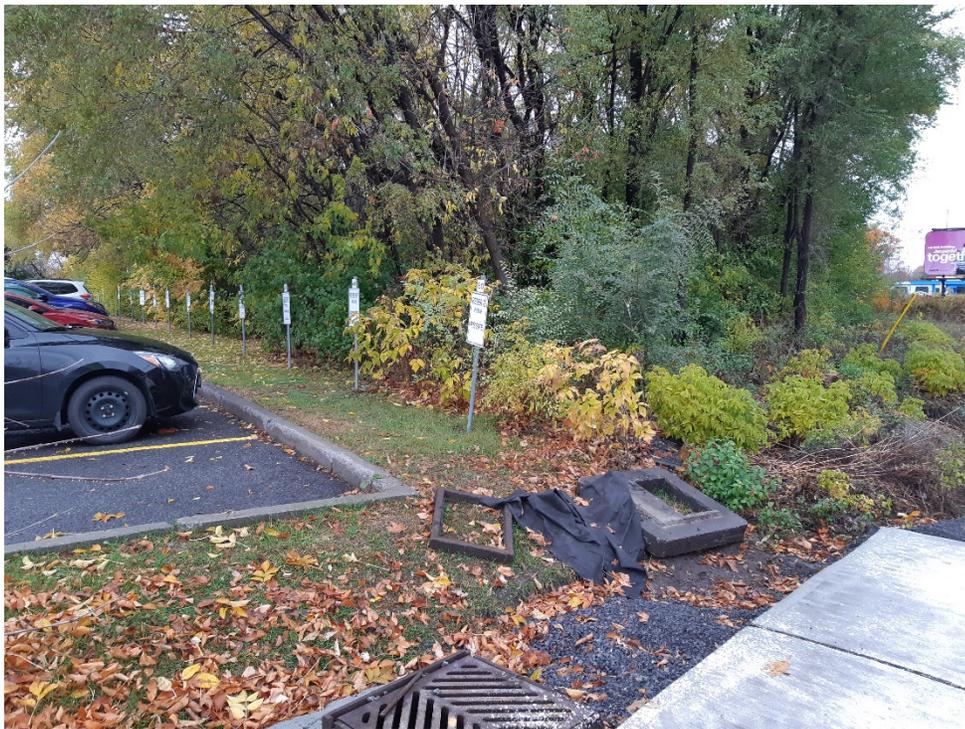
Southeast corner of 1178 Cummings Avenue property facing northwest.
